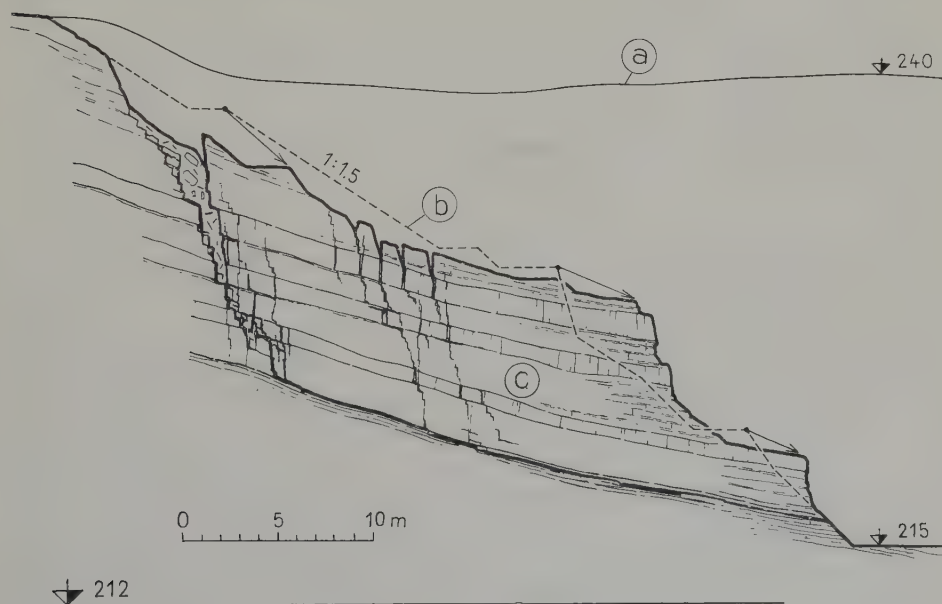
Section through landslide in the cutting at Bohdalec in Prague; a — original surface, b — graded slope of the excavation, c — slippage of shales along bedding planes.
